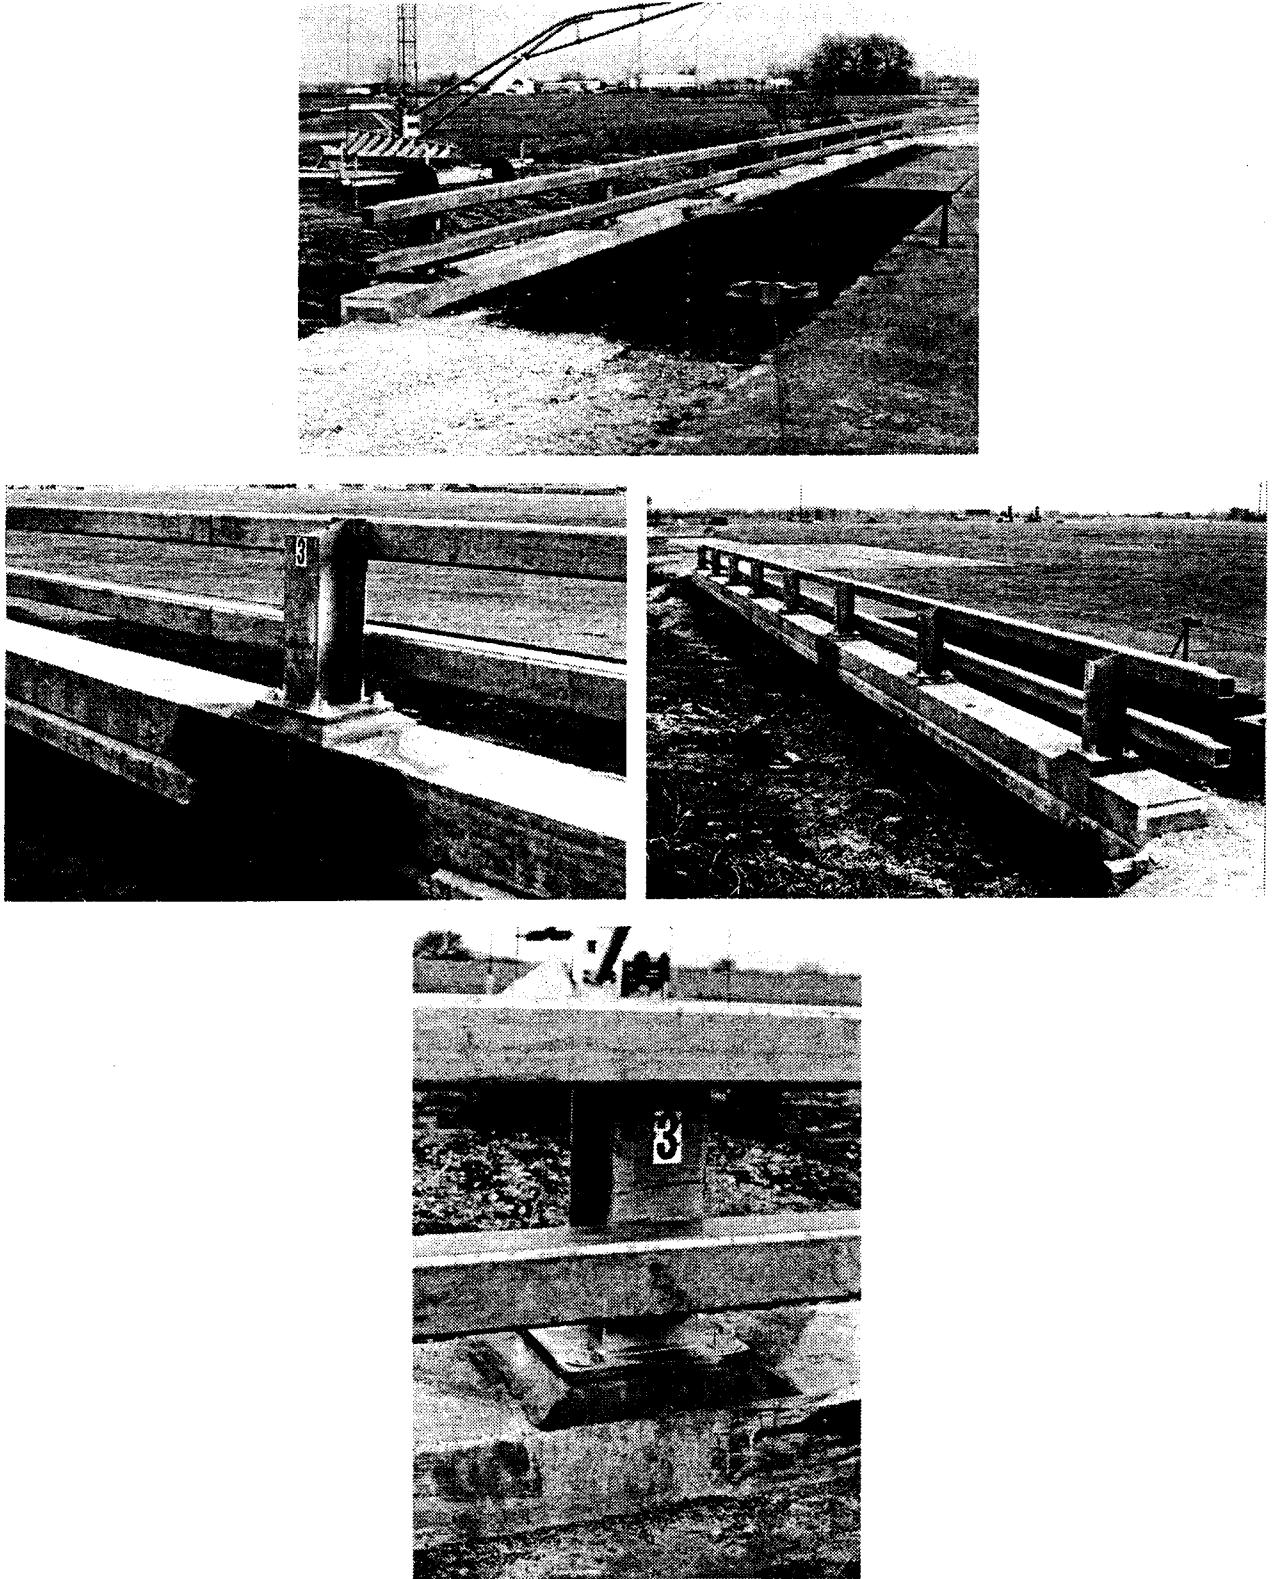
Alaska Multi-State Bridge Railing mounted on the curb before test 404311-3.
